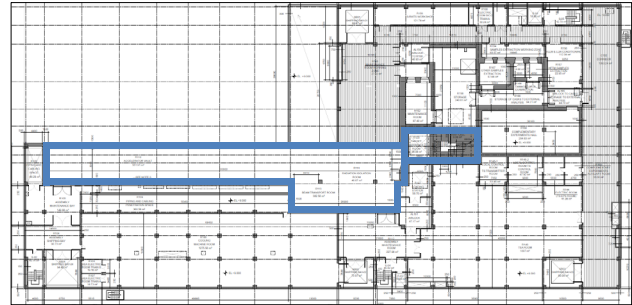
Layout of the MB first floor. Around the Accelerator Systems, walls are ranged between 1.5 m in the AV and 2.5 m in the TIR. Regarding the TC, walls are 3 m width downstream, and 4 m width upstream the beamline.
